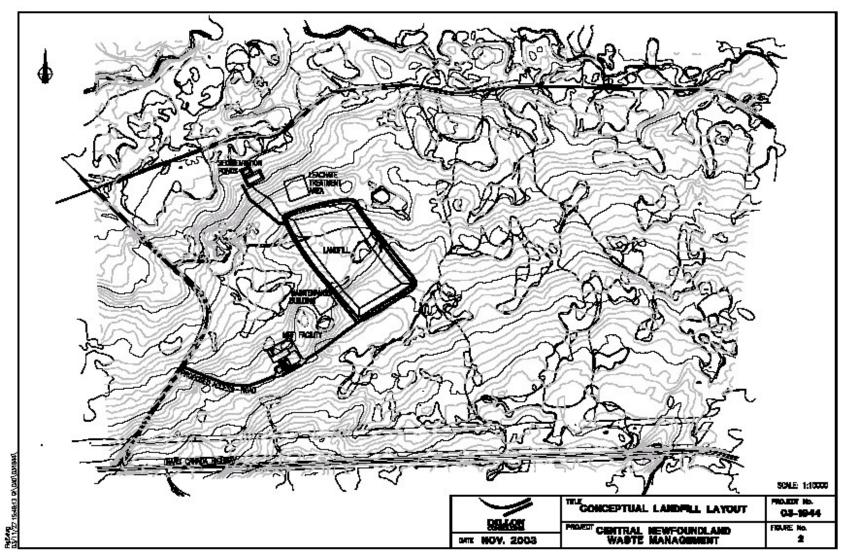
Conceptual Layout of Landfill Facility at Norris Arm
